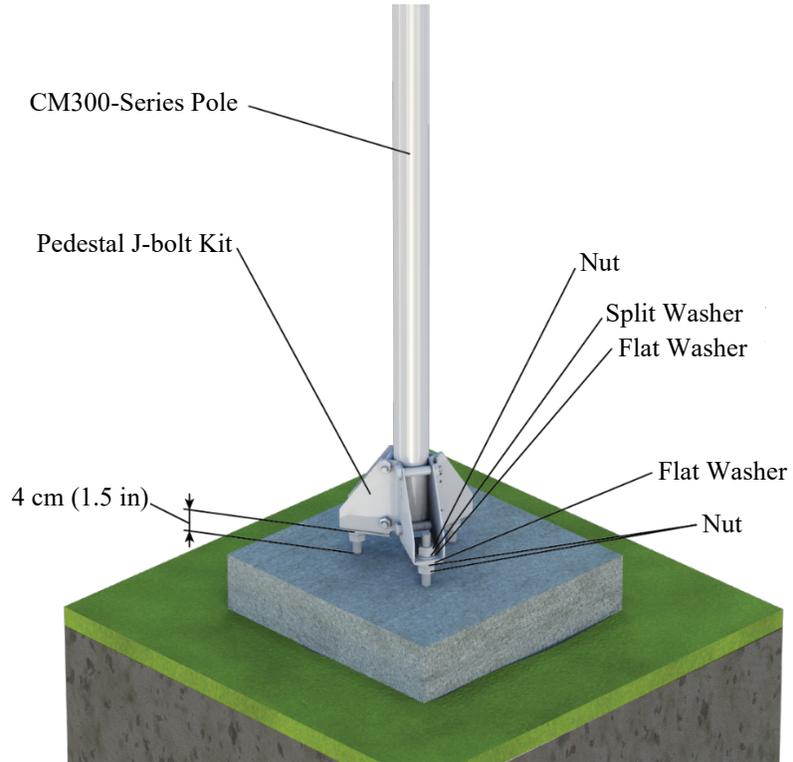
CM305 Mounting Pole with Pedestal J-Bolt Kit
